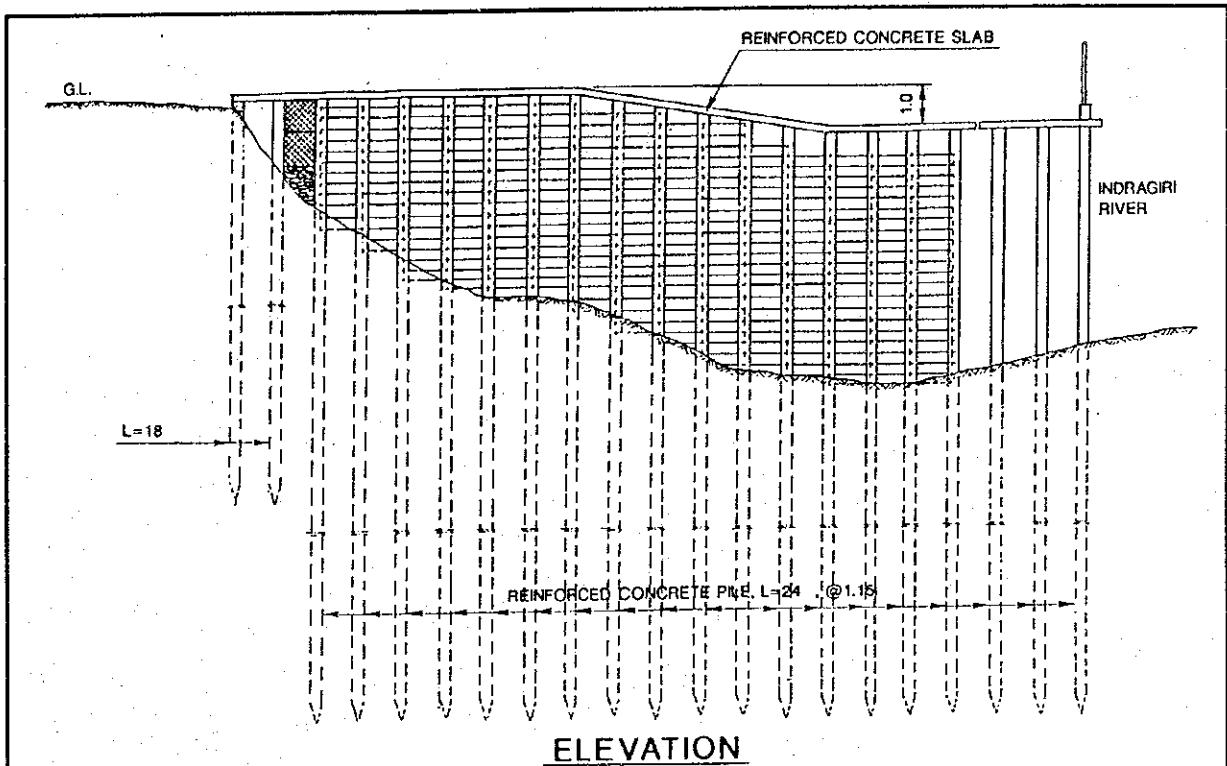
TYPICAL EXISTING ROAD BRIDGE
